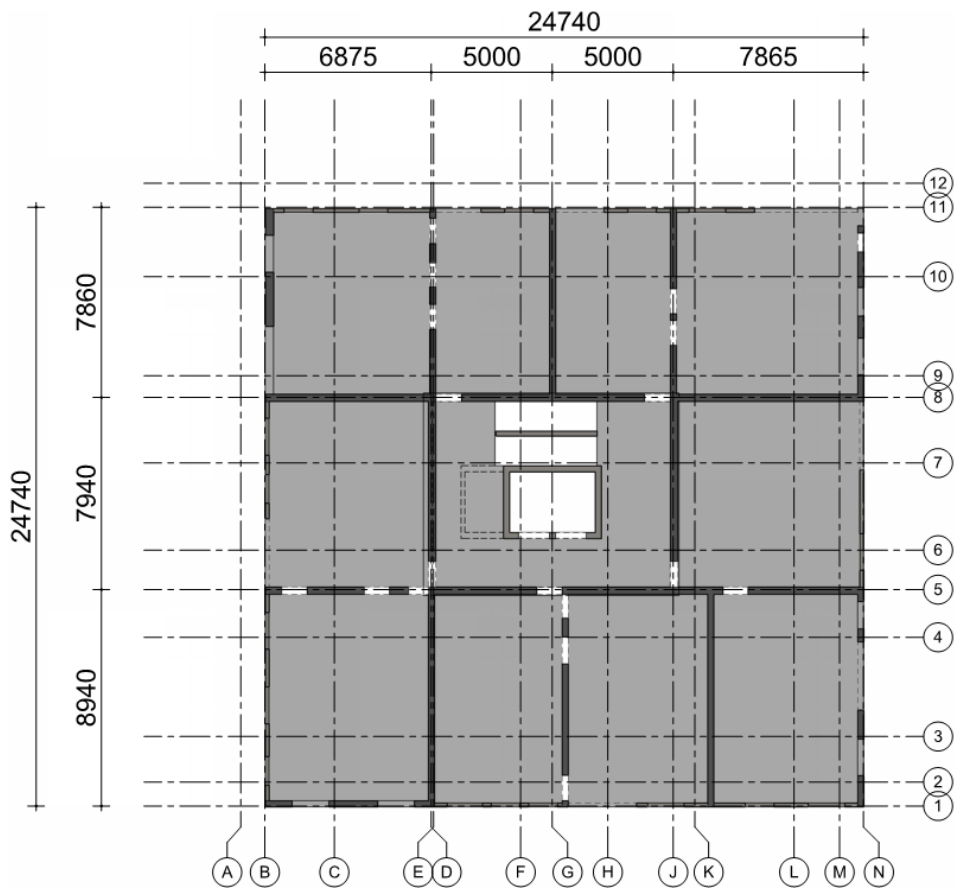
Floor plan of the fourth floor with the shear walls as bearing structure.
